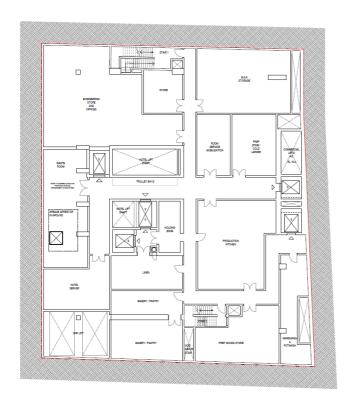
| Proposed basement level 3 (Source: Woods Bagot)
